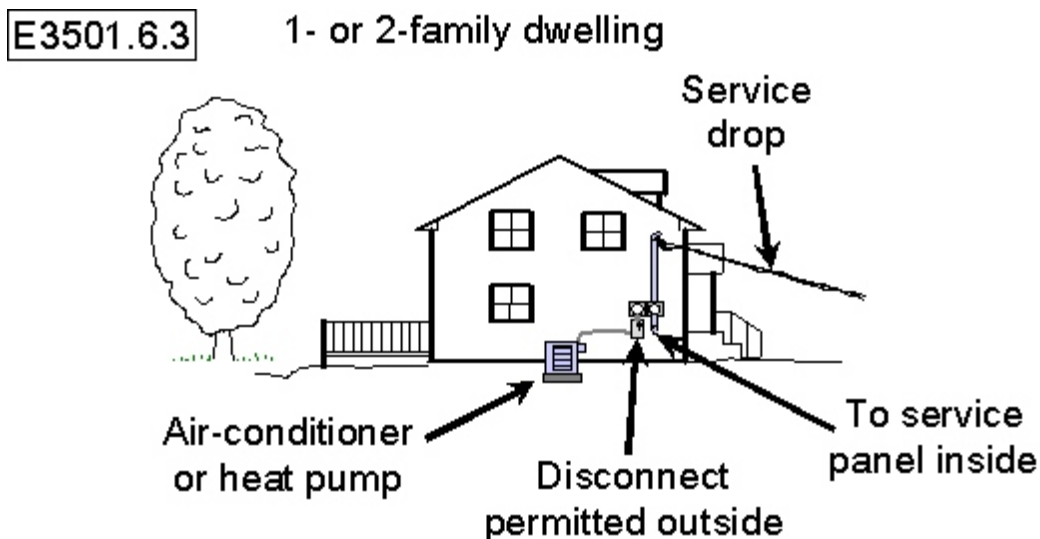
In the case of a single- or two-family dwelling, it is permitted to provide a separate disconnecting means on the outside of the house for separately metered space conditioning equipment.
